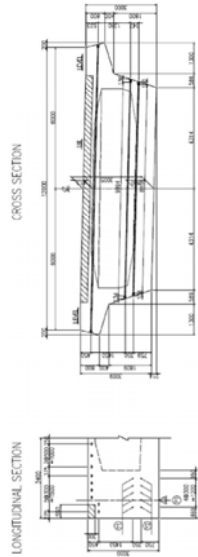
Cross-section wise Cable Arrangement of the Cross Beam (above P1)
